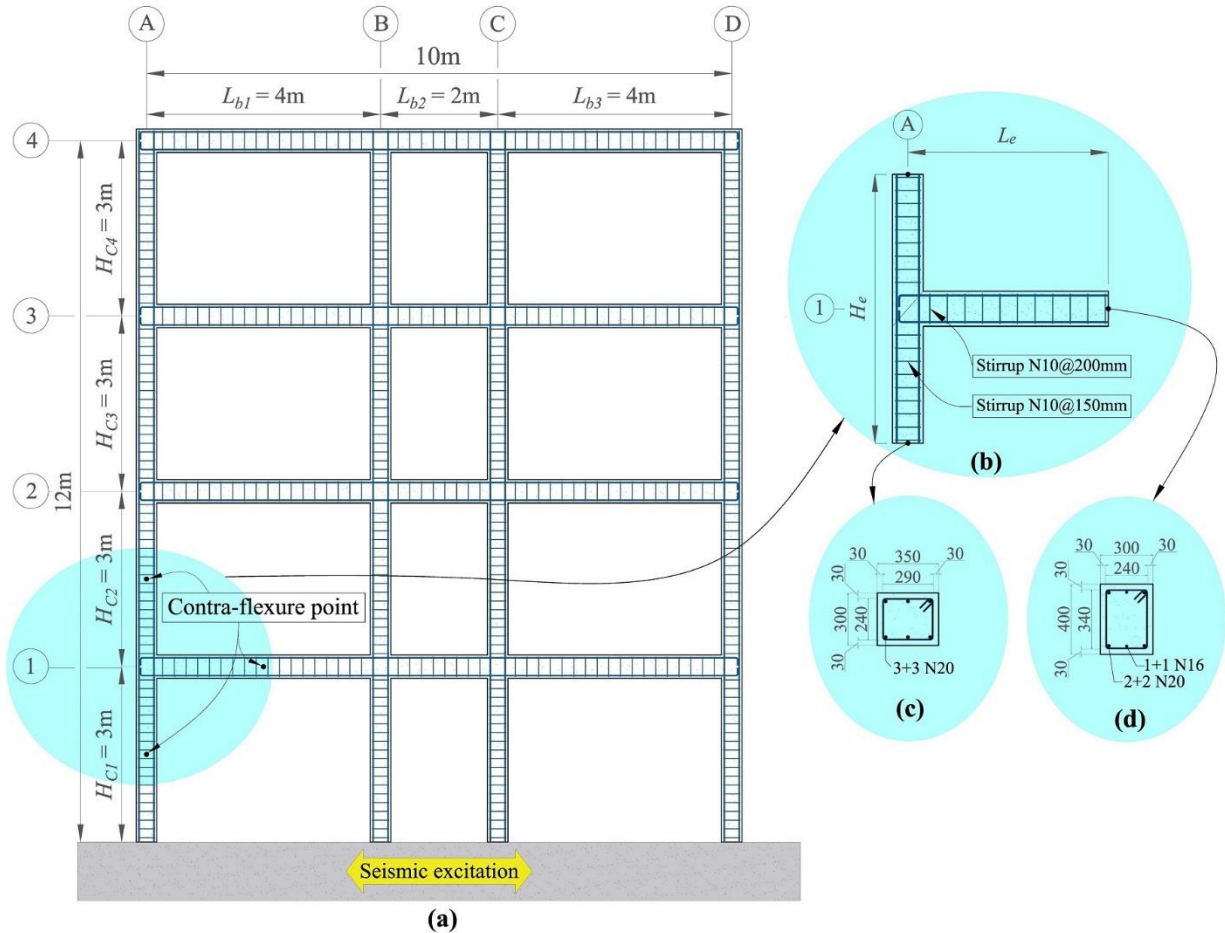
Geometry of case study model: (a) Full-scale RC moment resisting frame, (b) Exterior beam-column joint, (c) Column section, (d) Beam section
